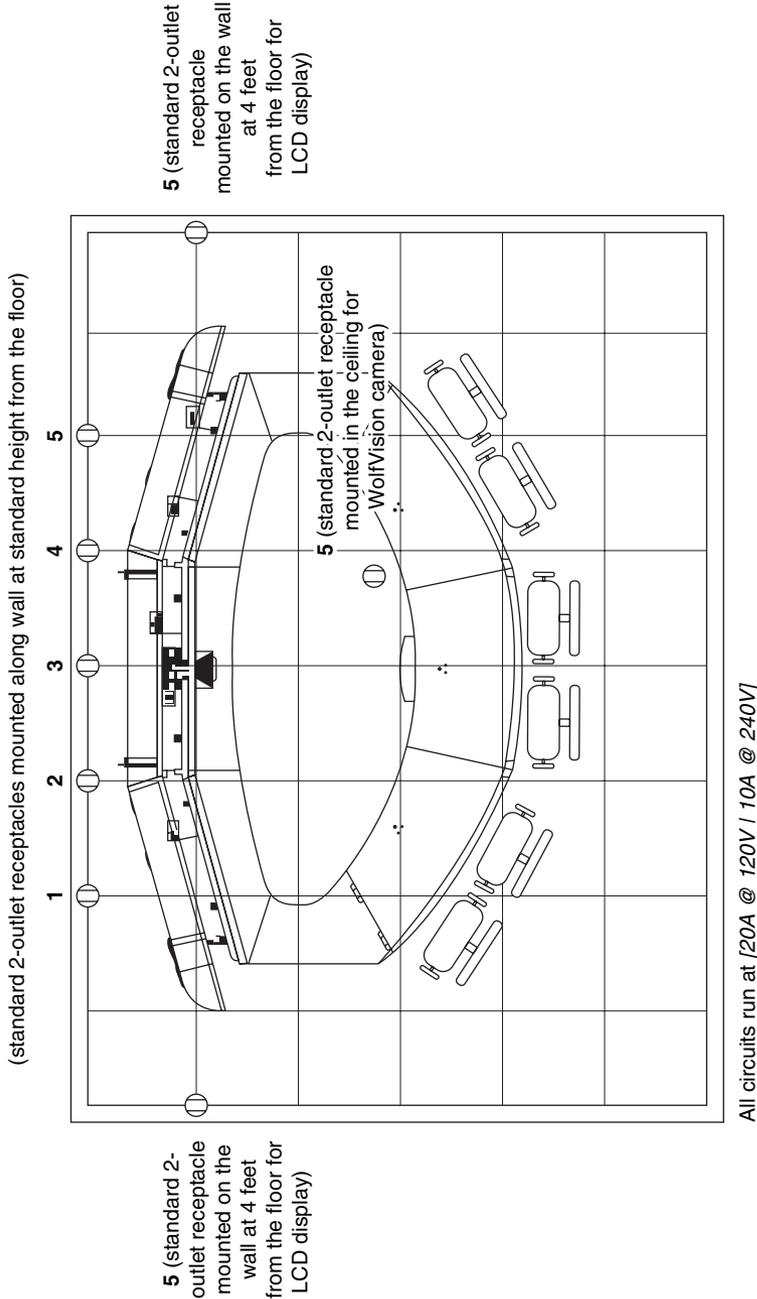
Reflected ceiling plan showing recommended power outlet locations
